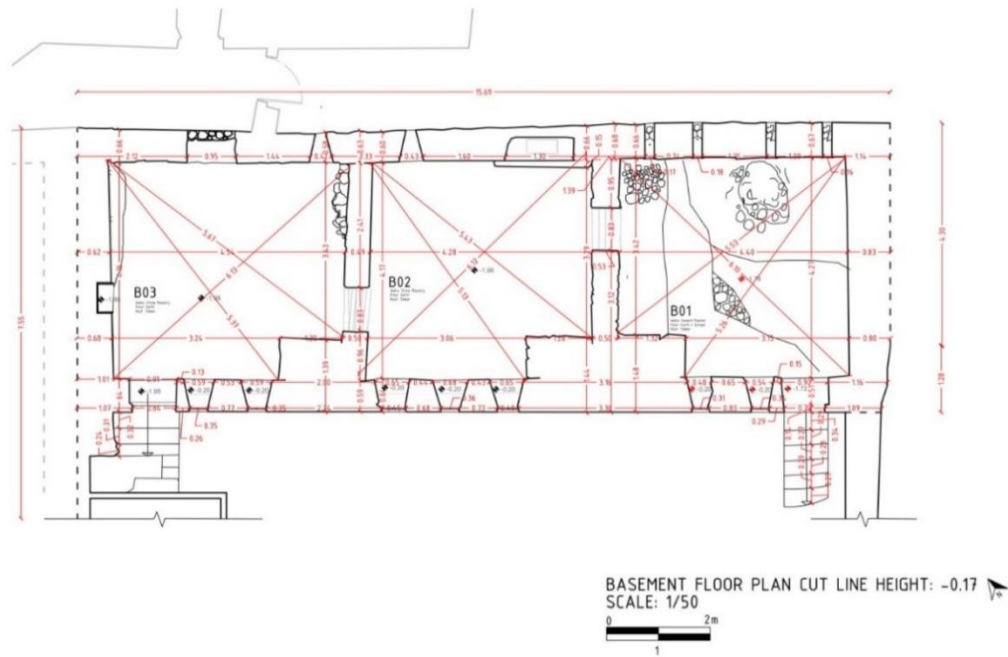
Basement floor plan - cut line height: -0,17m. (METU CONS, 2019)
